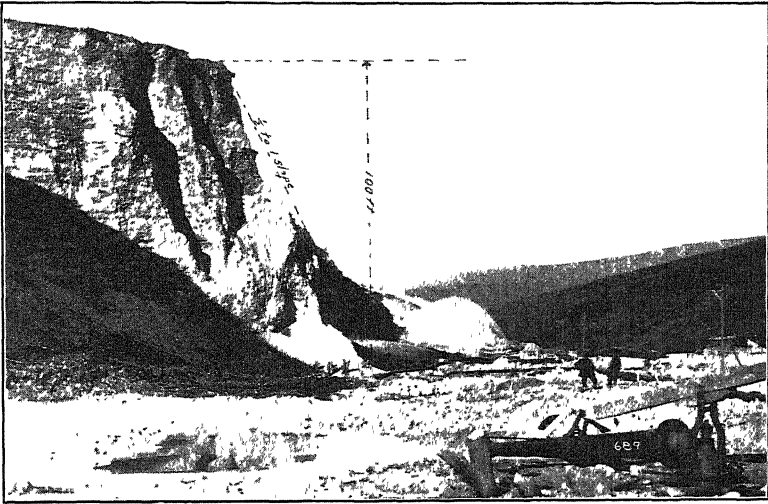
TYPICAL PLACER-MINING OPERATION.
